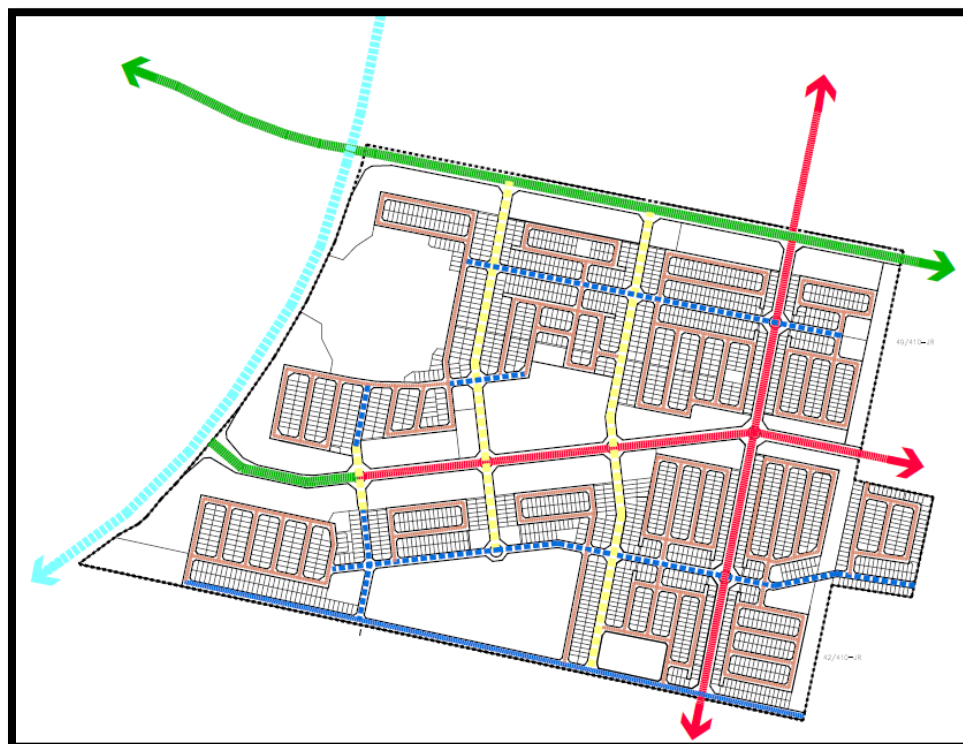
Proposed Road Layout and Configuration for Clayville Extensions 71, 76-80.
